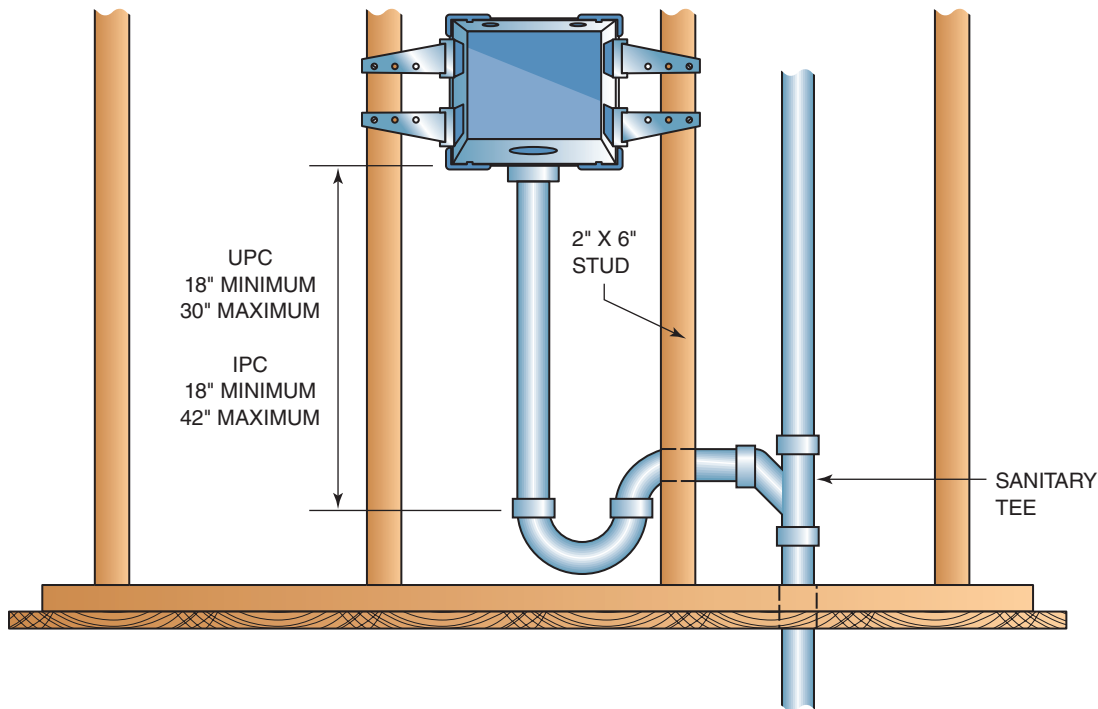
Some washing machine box installations may have the p-trap above the floor.
